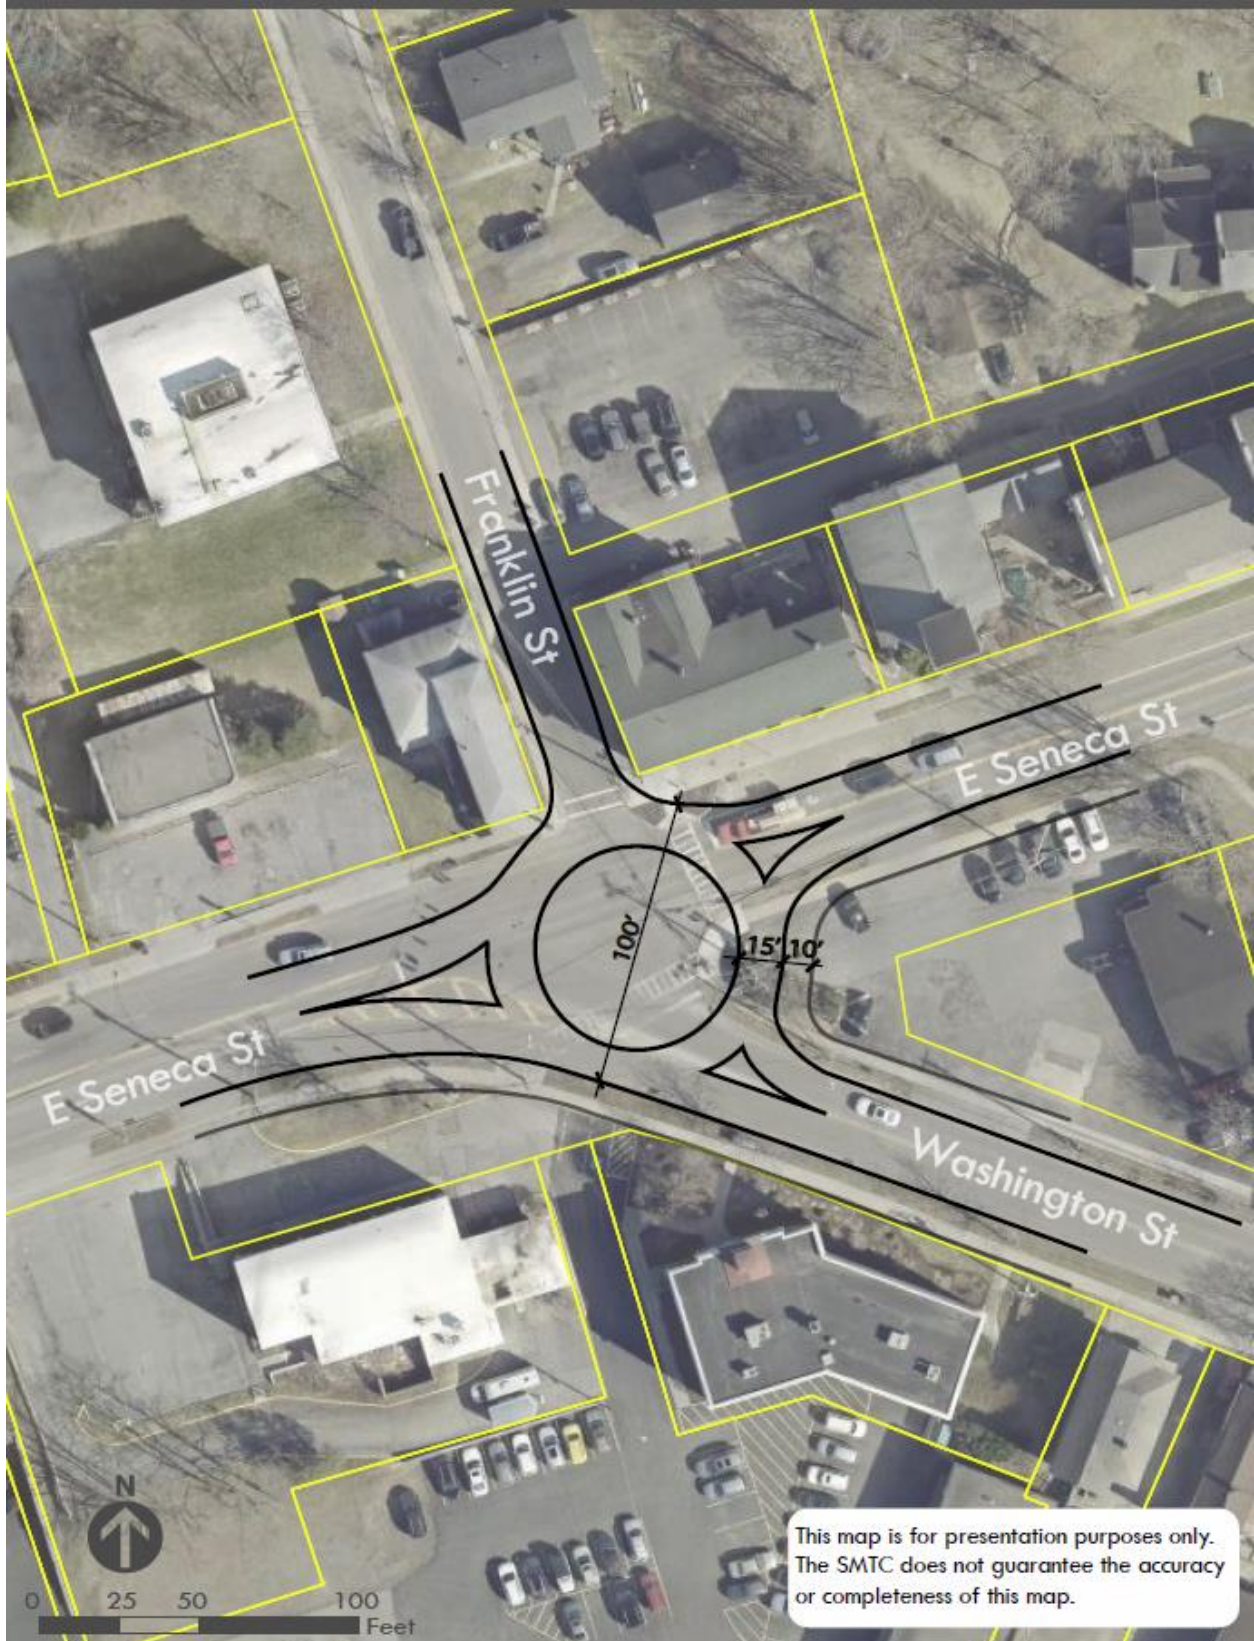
East Seneca Street/Washington Street Roundabout Geometry Screening Concept
